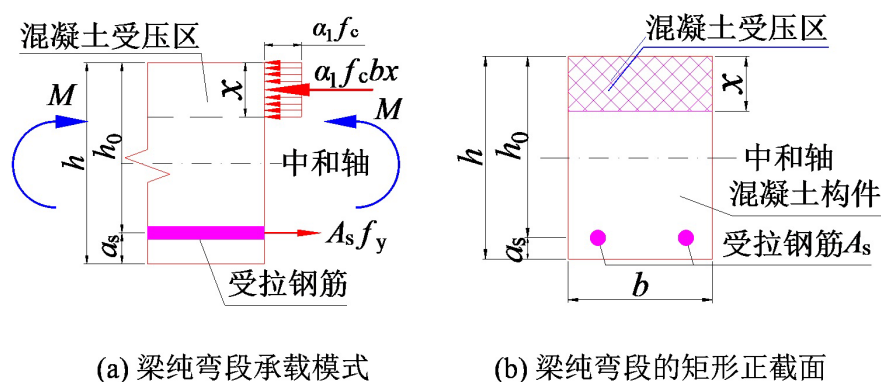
Compression zone and tensile reinforcement of singly reinforced beam with rectangular cross-section
